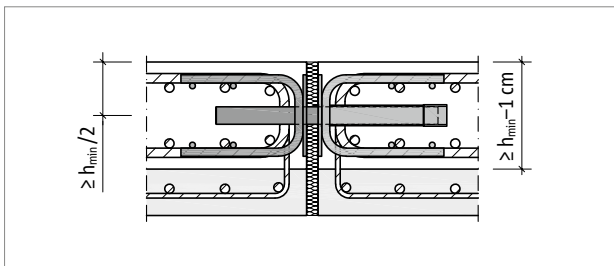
Schöck Stacon® type SLD: on-site reinforcement with semi precast floor slab units
